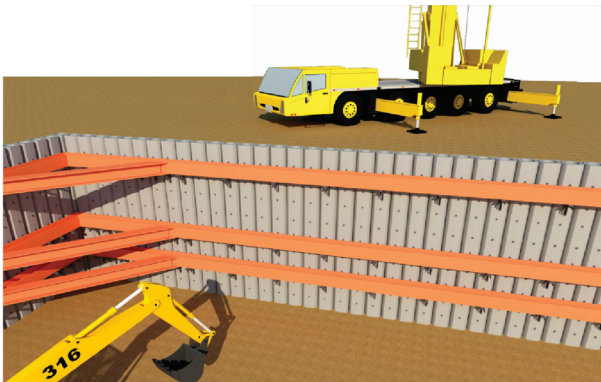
A schematic drawing of PHC-W earth retaining wall (Choi, 2014)
